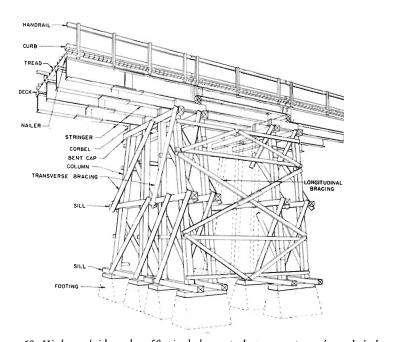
Highway bridge, class 50, single-lane, steel stringer spans, framed timber tower on concrete pedestals.
